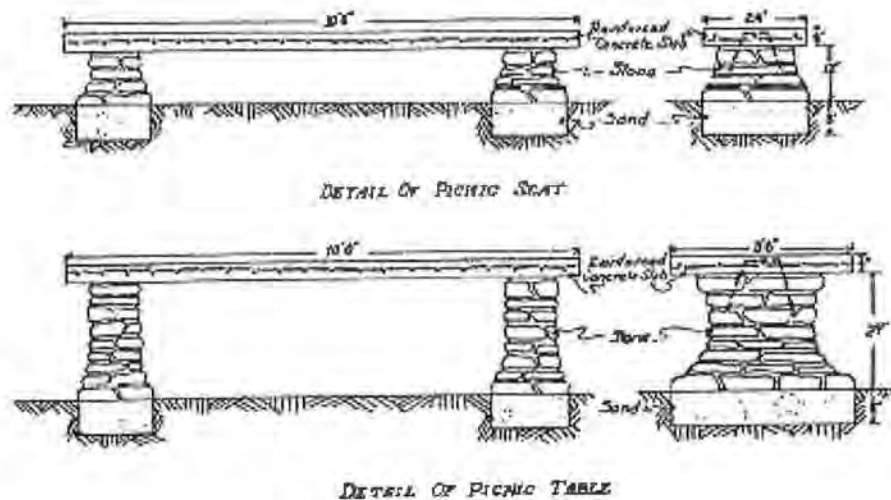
Picnic table detail from the original plans, drawn April 1934. (Construction Plans, MHD; Site Development Unit, MnDOT, St. Paul.)
